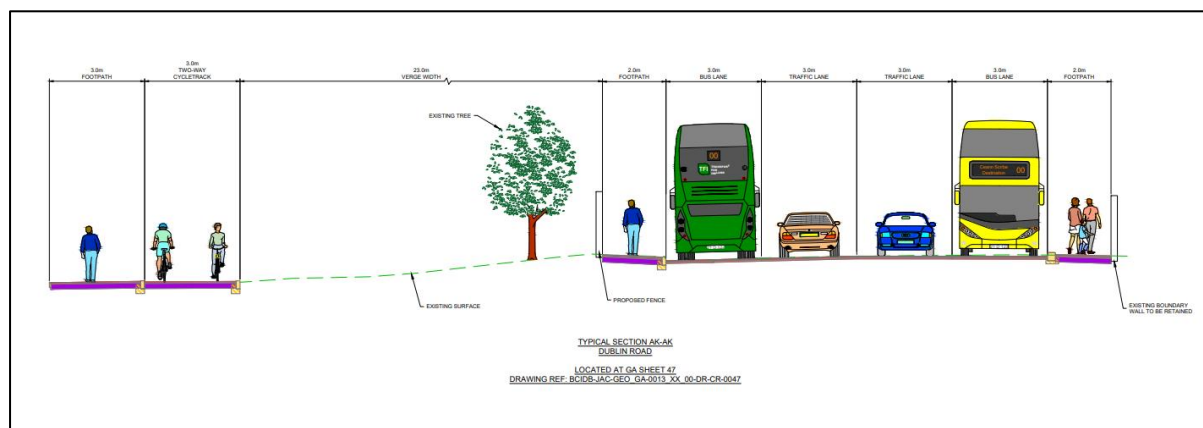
Extract from Typical Cross-section Drawing at Cross Section AK-AK on Dublin Road (Sheet 21)
